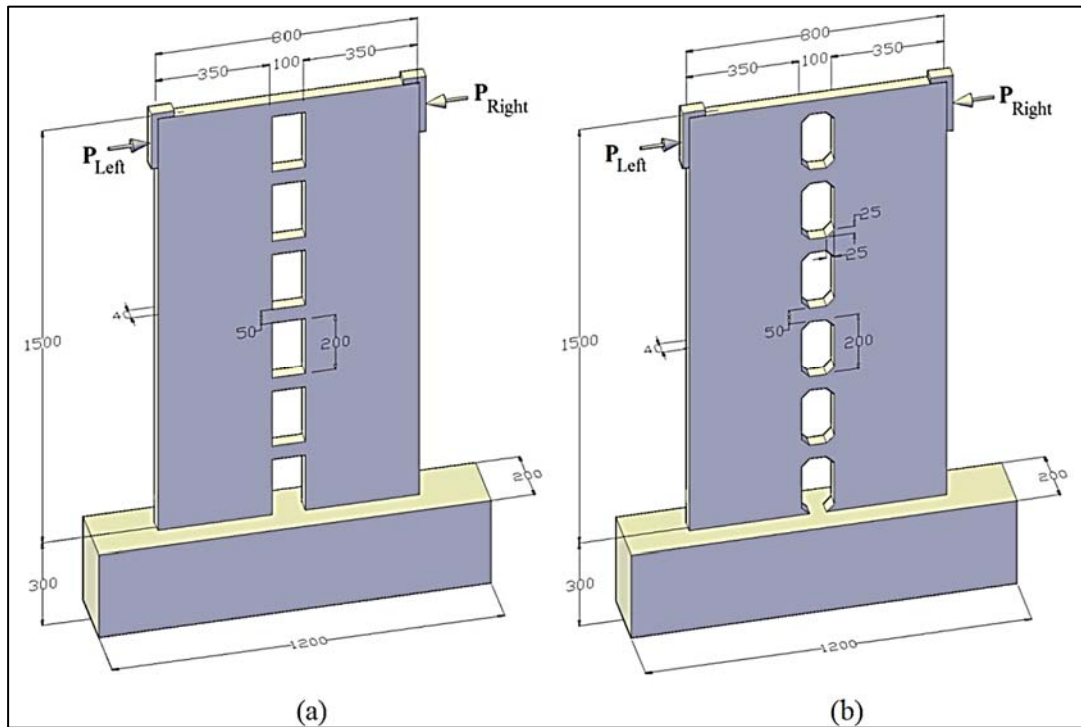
Layouts of shear walls with single band of a) rectangular openings (Model 1) b) octagonal openings (Model 2)
